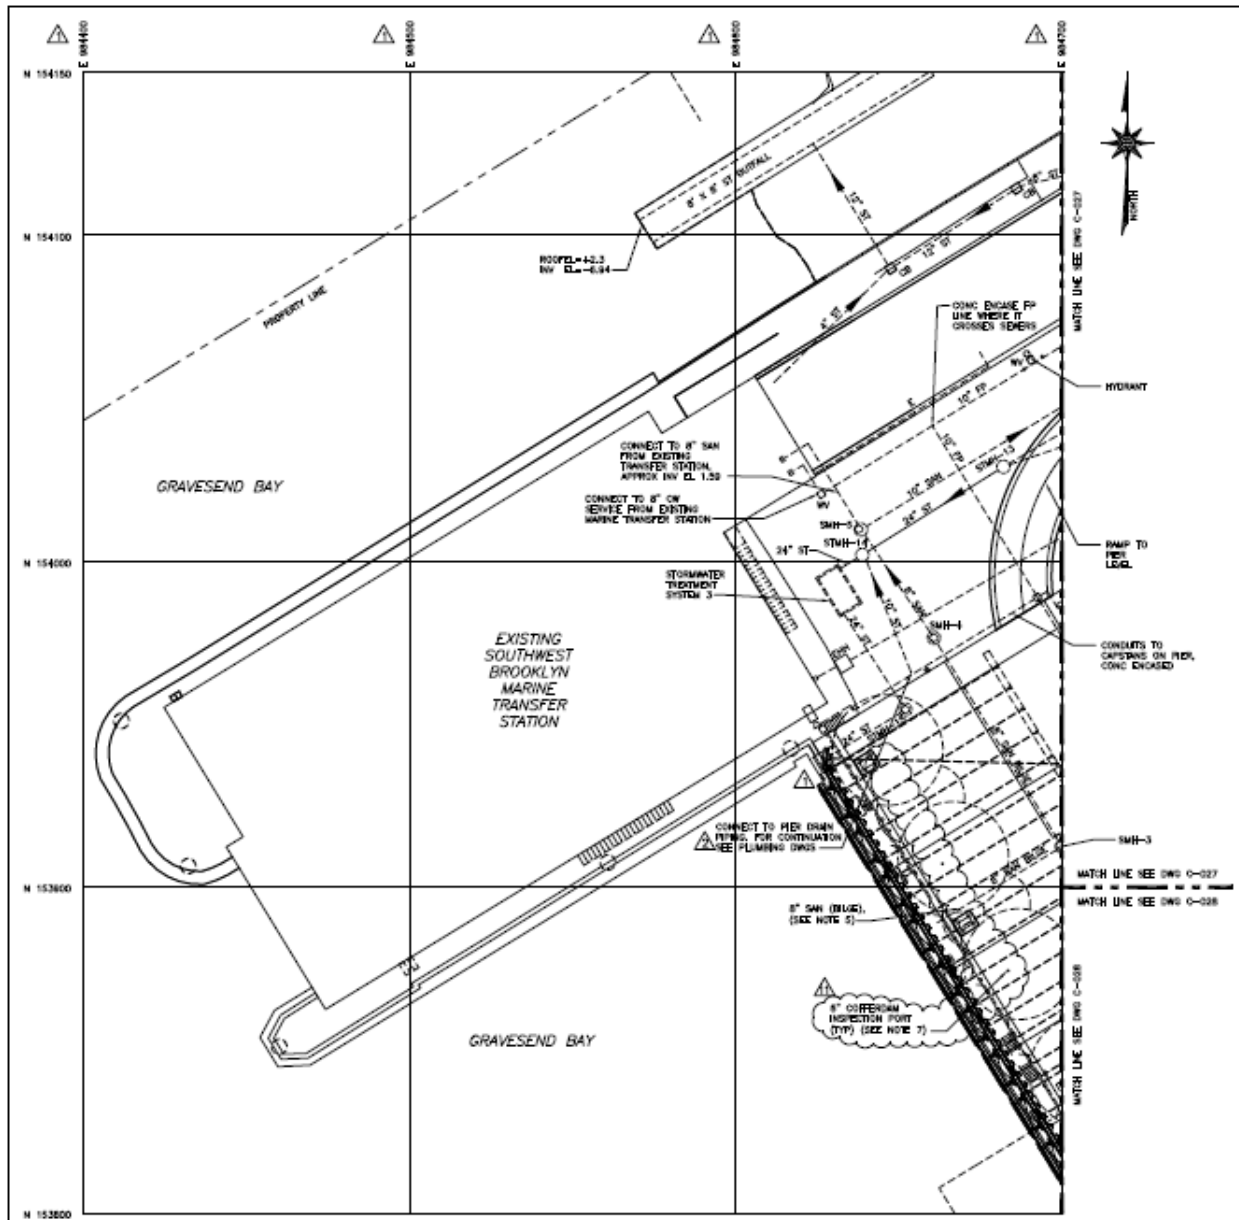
Cofferdam Locations under the Pier Deck and Parking Lot
